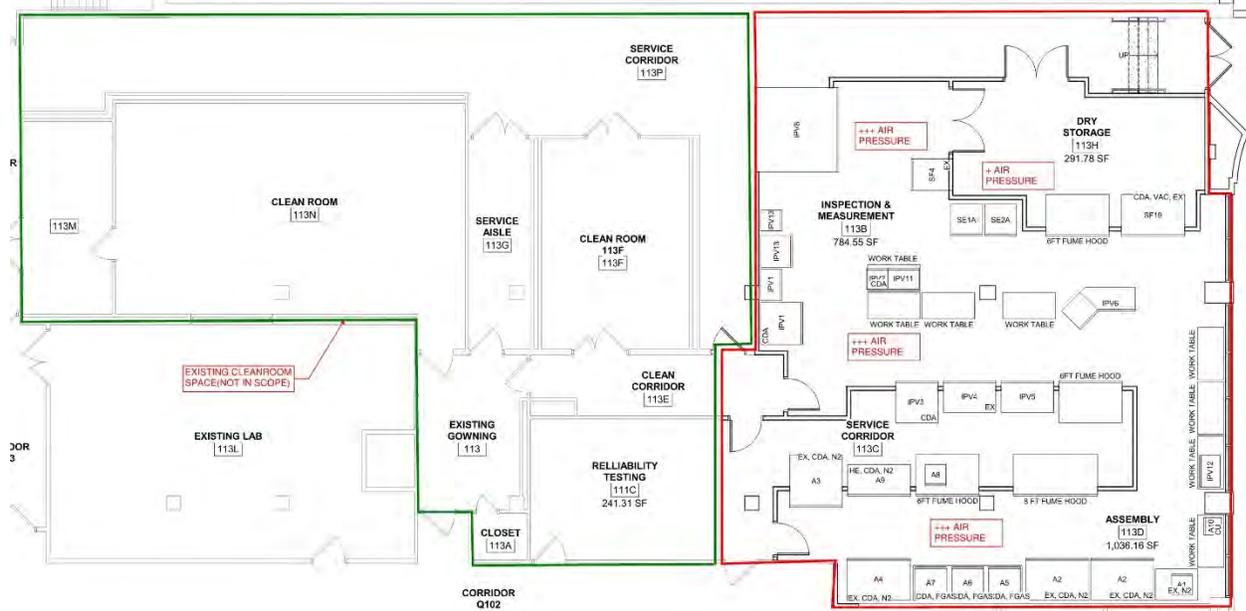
Cleanroom Pressurization Plan -Hybrid EEW
